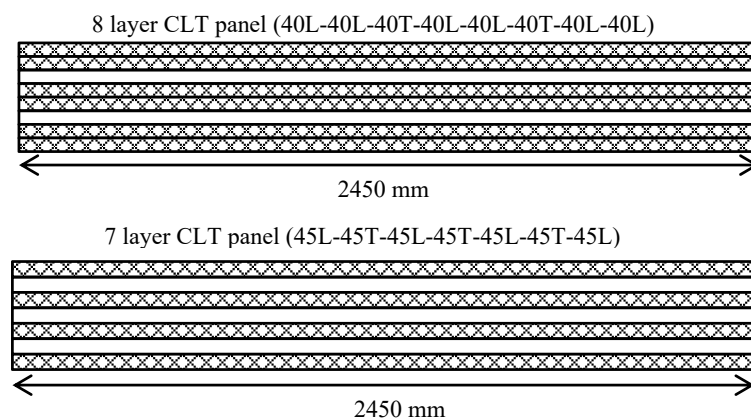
Cross sections of CLT panels for preliminary design. Top: Floor 1, 8 layered CLT panel, 320 mm thick. Bottom: Floor 2, 7 layered CLT panel, 335 mm thick.
